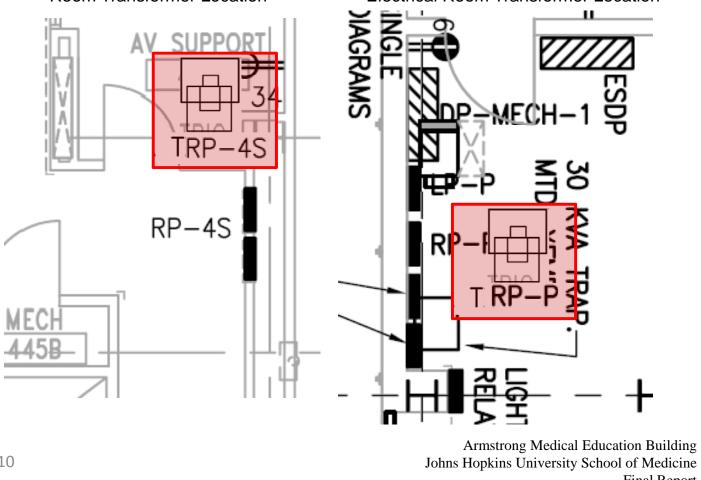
Fourth Floor Electrical Room Transformer Location
